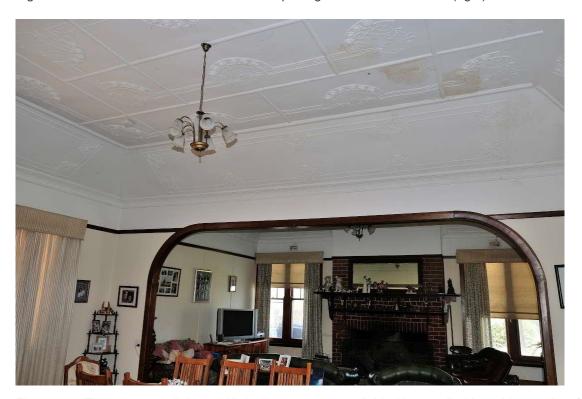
The generous dining and living room areas are divided by a wall with a wide opening, featuring arched corners. This detail is repeated throughout the dwelling at several doorways.
